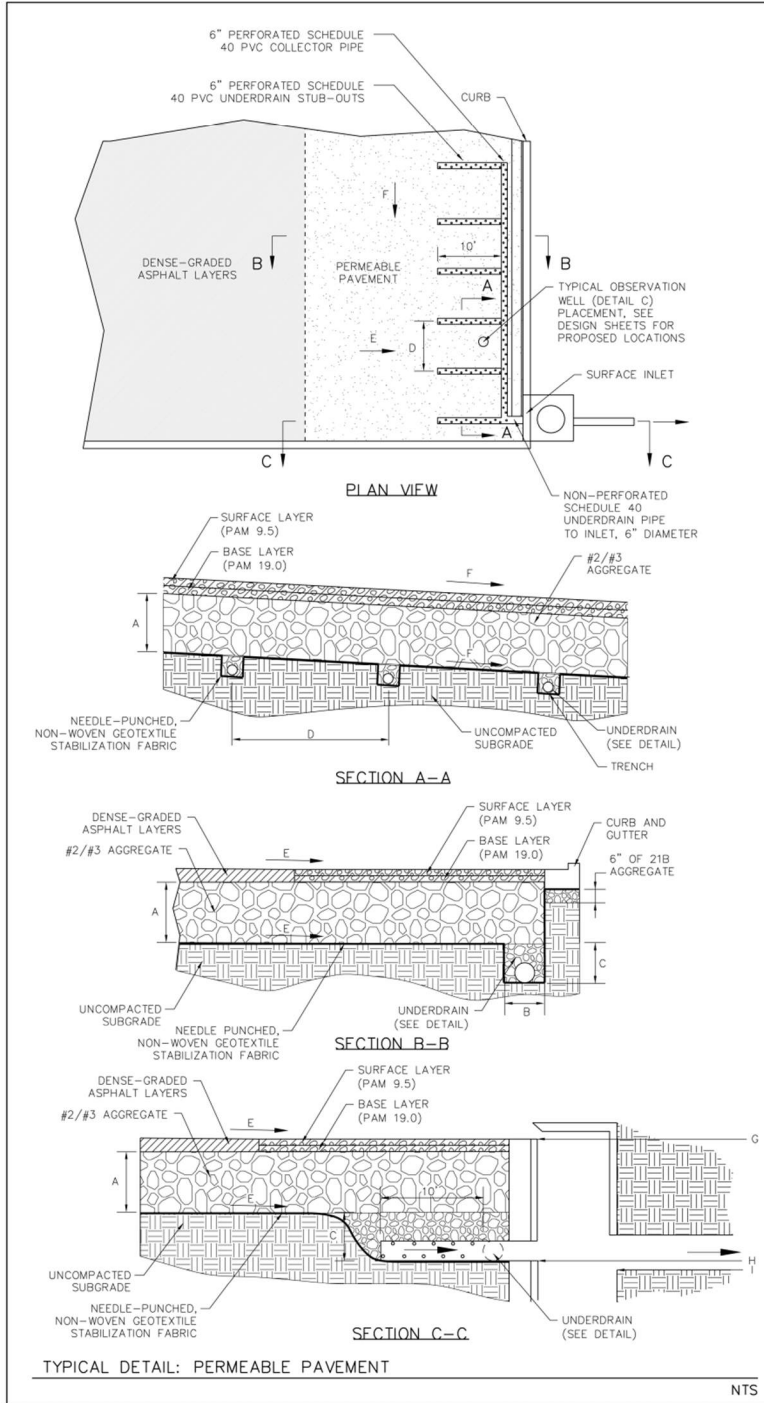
Typical Permeable Pavement Detail (Parking Lots)
